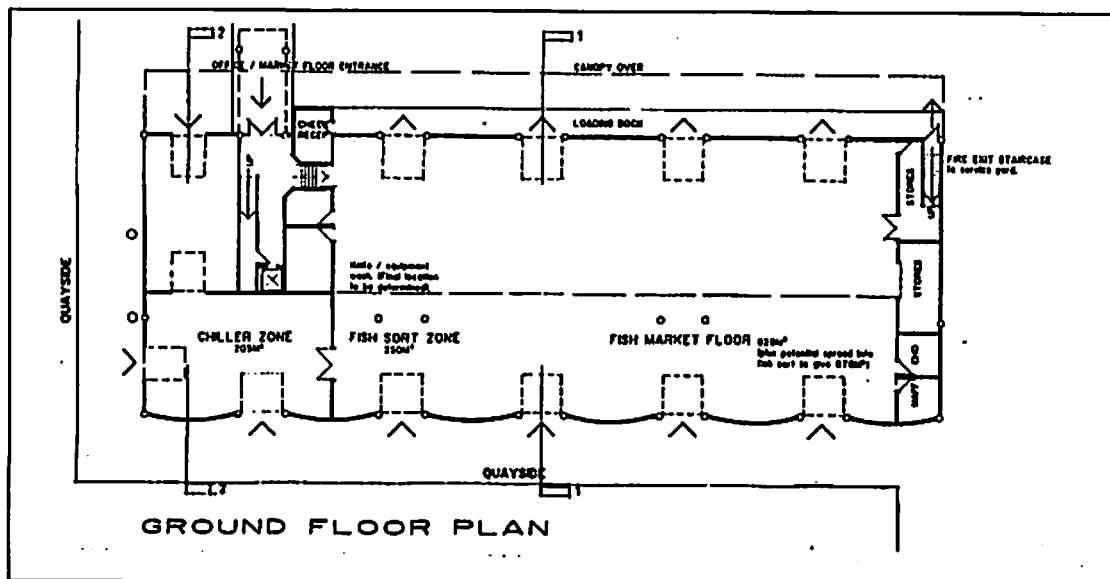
Plan of ground floor (there were some subsequent modifications to the chiller layout at the construction stage)
